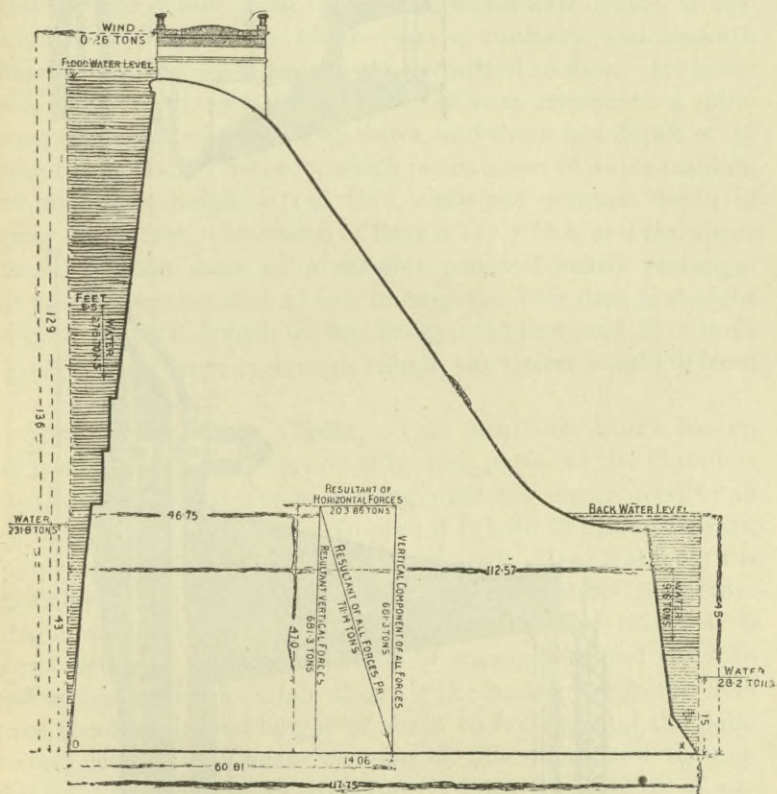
CROSS-SECTION OF VYRNWY DAM, WALES.
